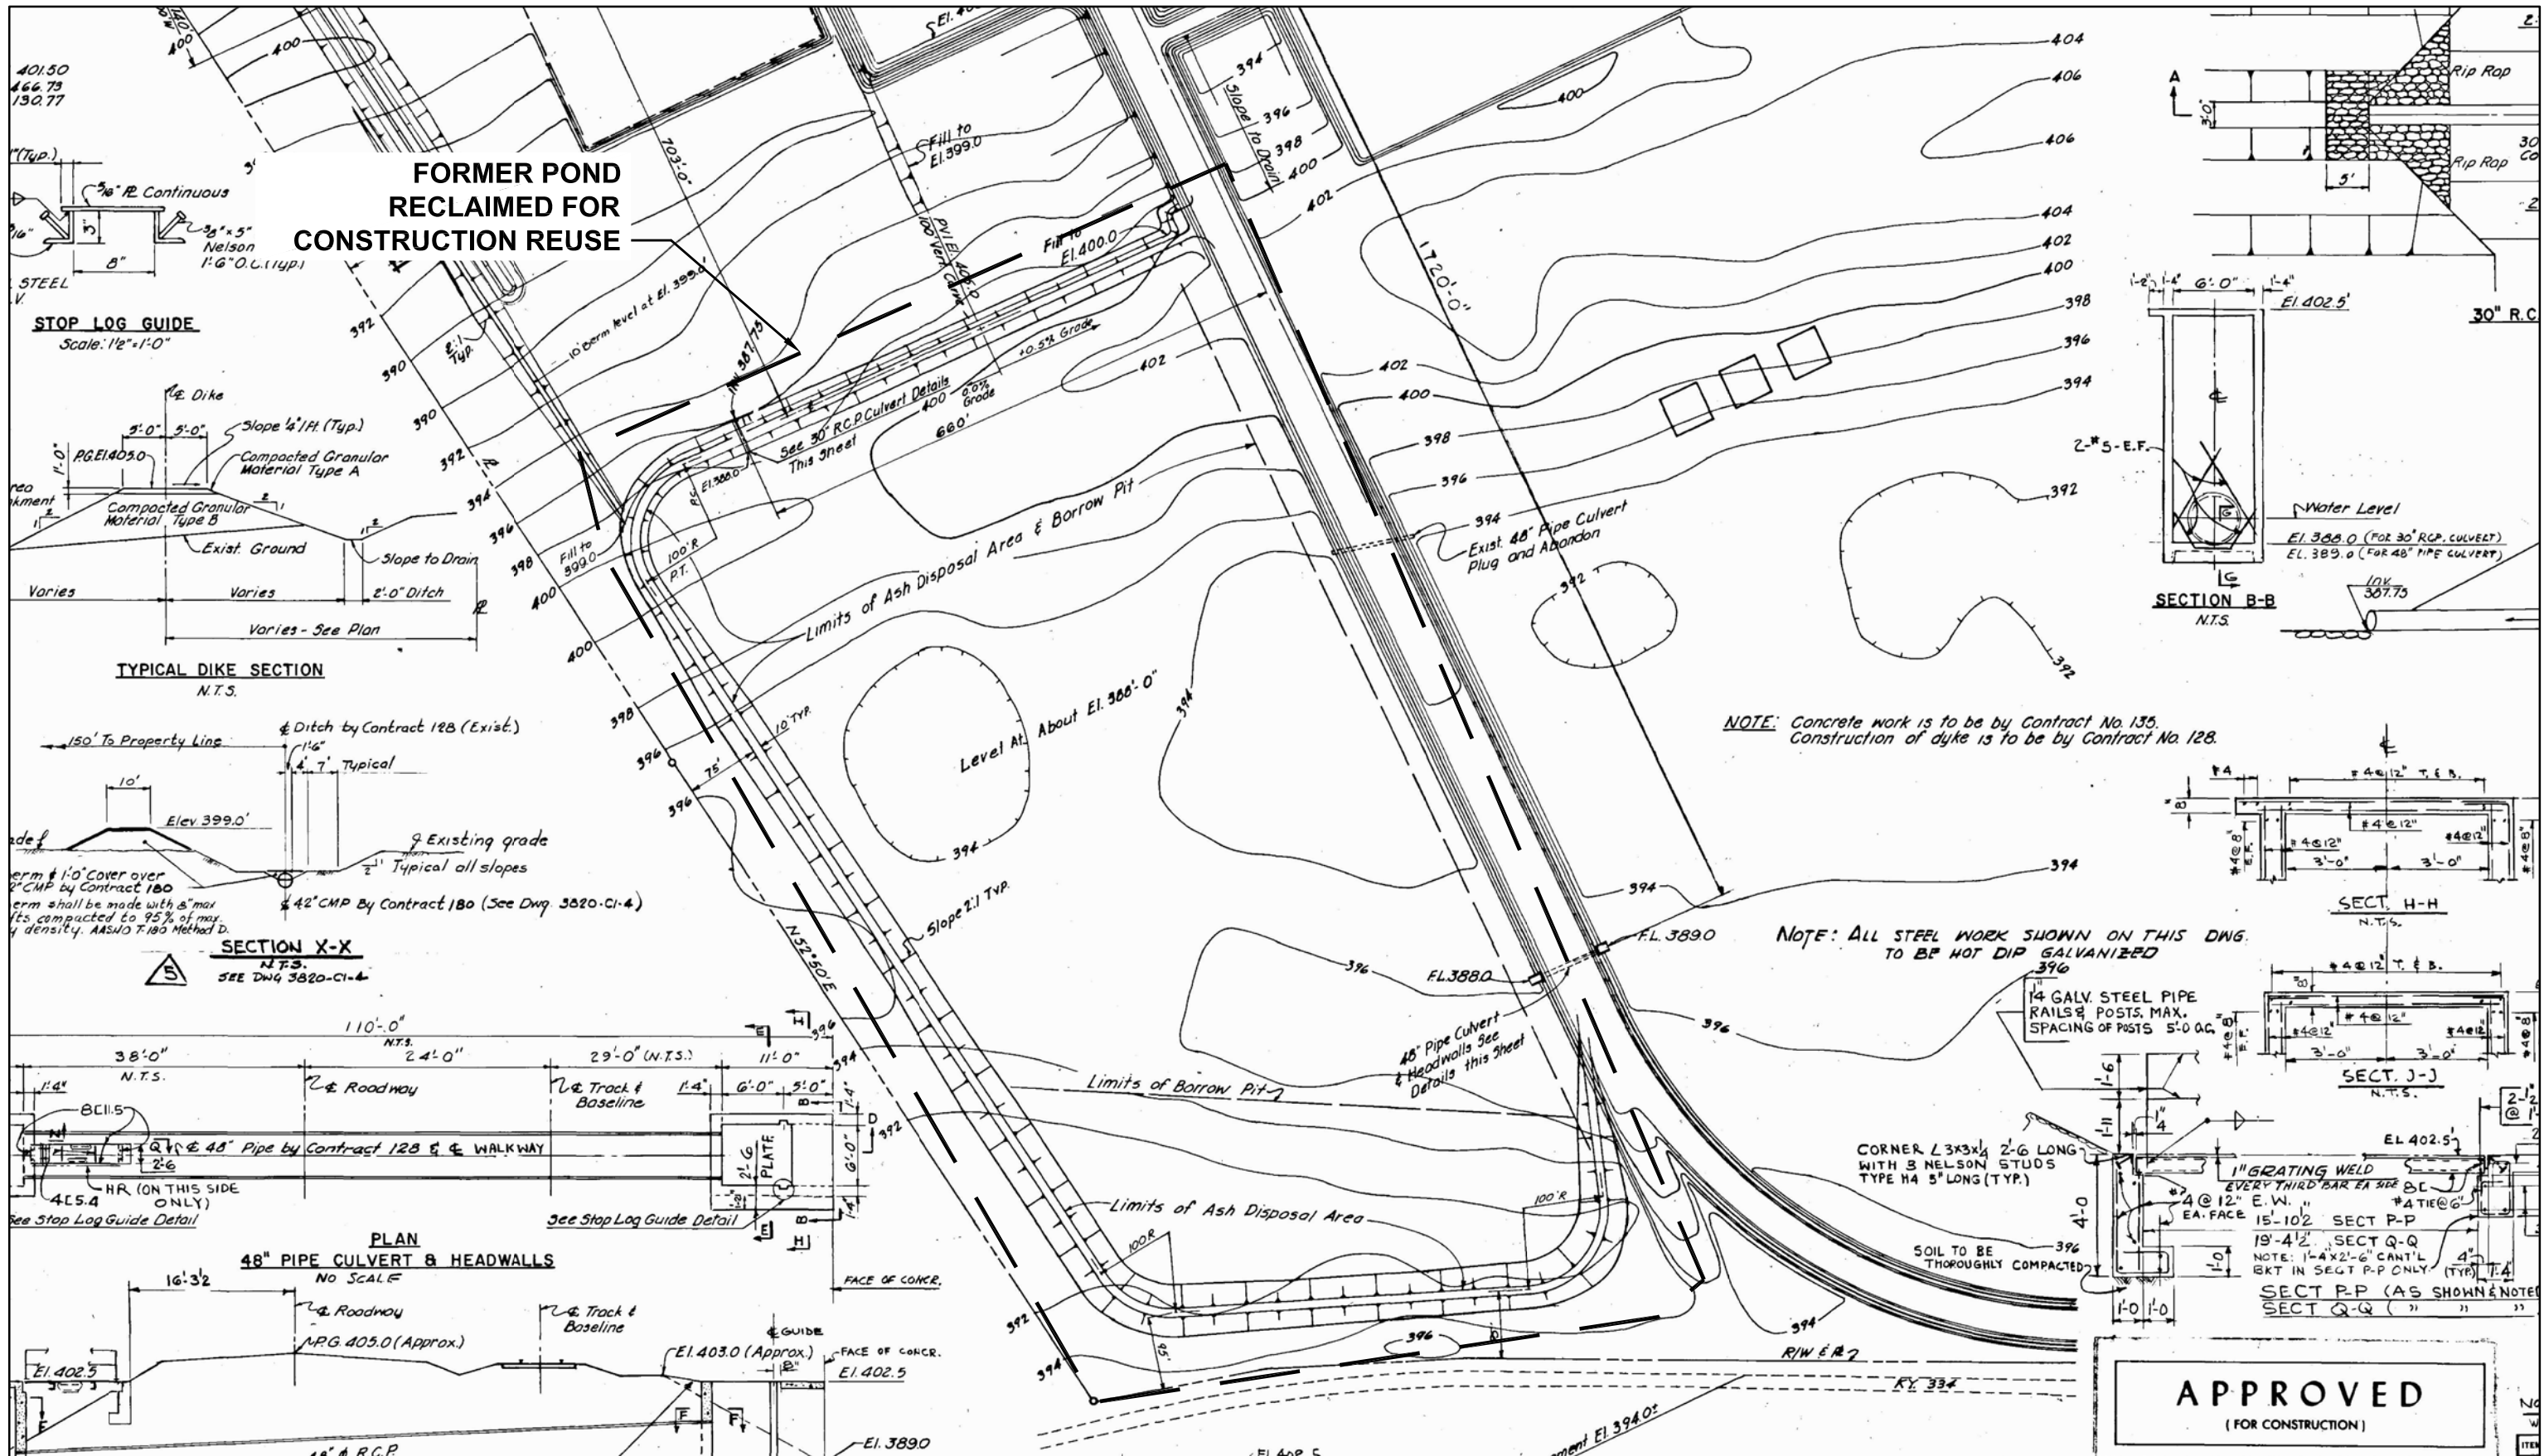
IMAGE REFERENCE: BIG RIVERS RECC, SITE PLAN SHOWING ASH DISPOSAL DYKES DRAINAGE STRUCTURES & DITCHES, DRAWING NO. 3820-C1-3 REV. 6 - FINAL AS BUILT, FEBRUARY 12, 1971.
